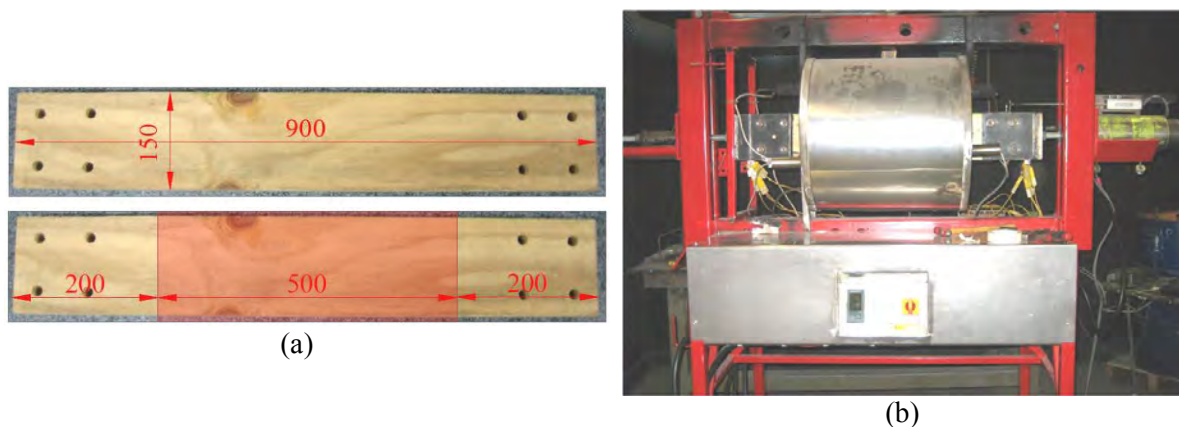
(a) Photos of the specimens with dimensions in mm. (b) Specimen in the custom-made furnace before testing.
